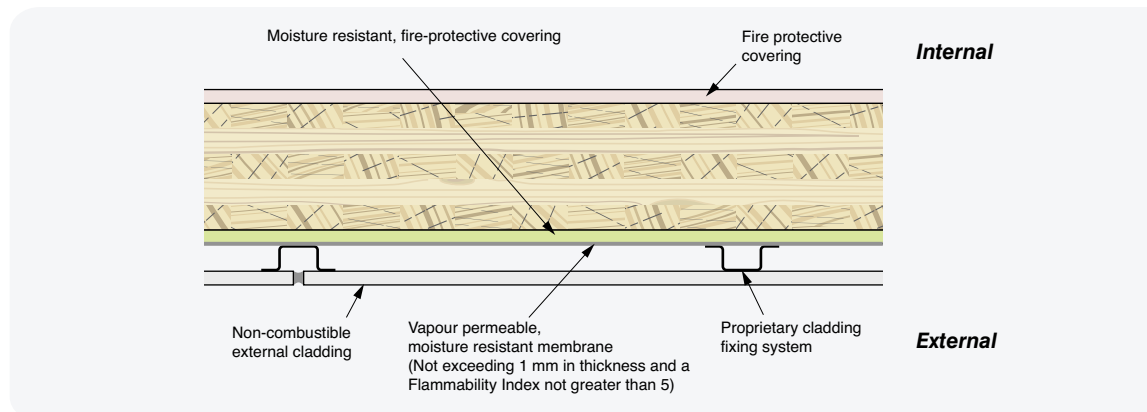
Fire-protected massive timber external wall with external lightweight cladding.
